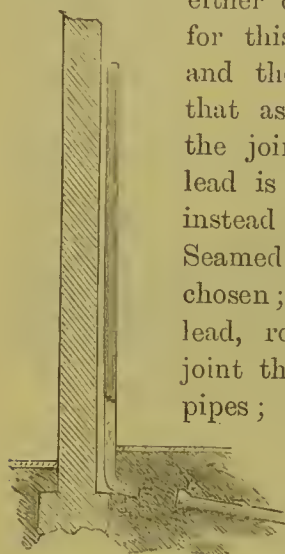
Soil-pipe not connected with the Drain at foot.
